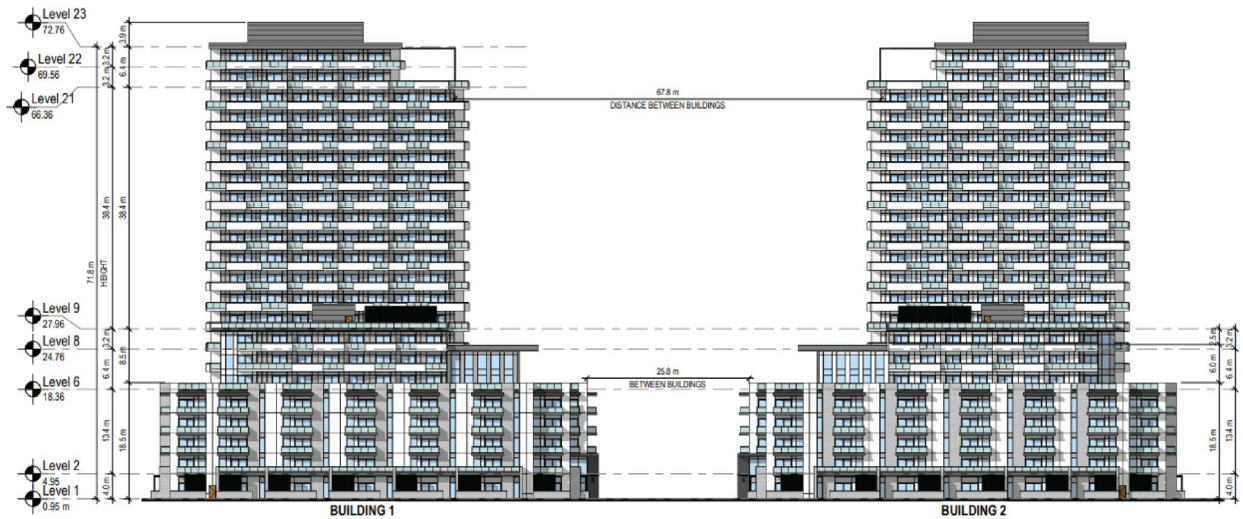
Exterior side elevation, facing the “Green Space” (E) and “Rapid Transit Corridor” (W) Place Types
